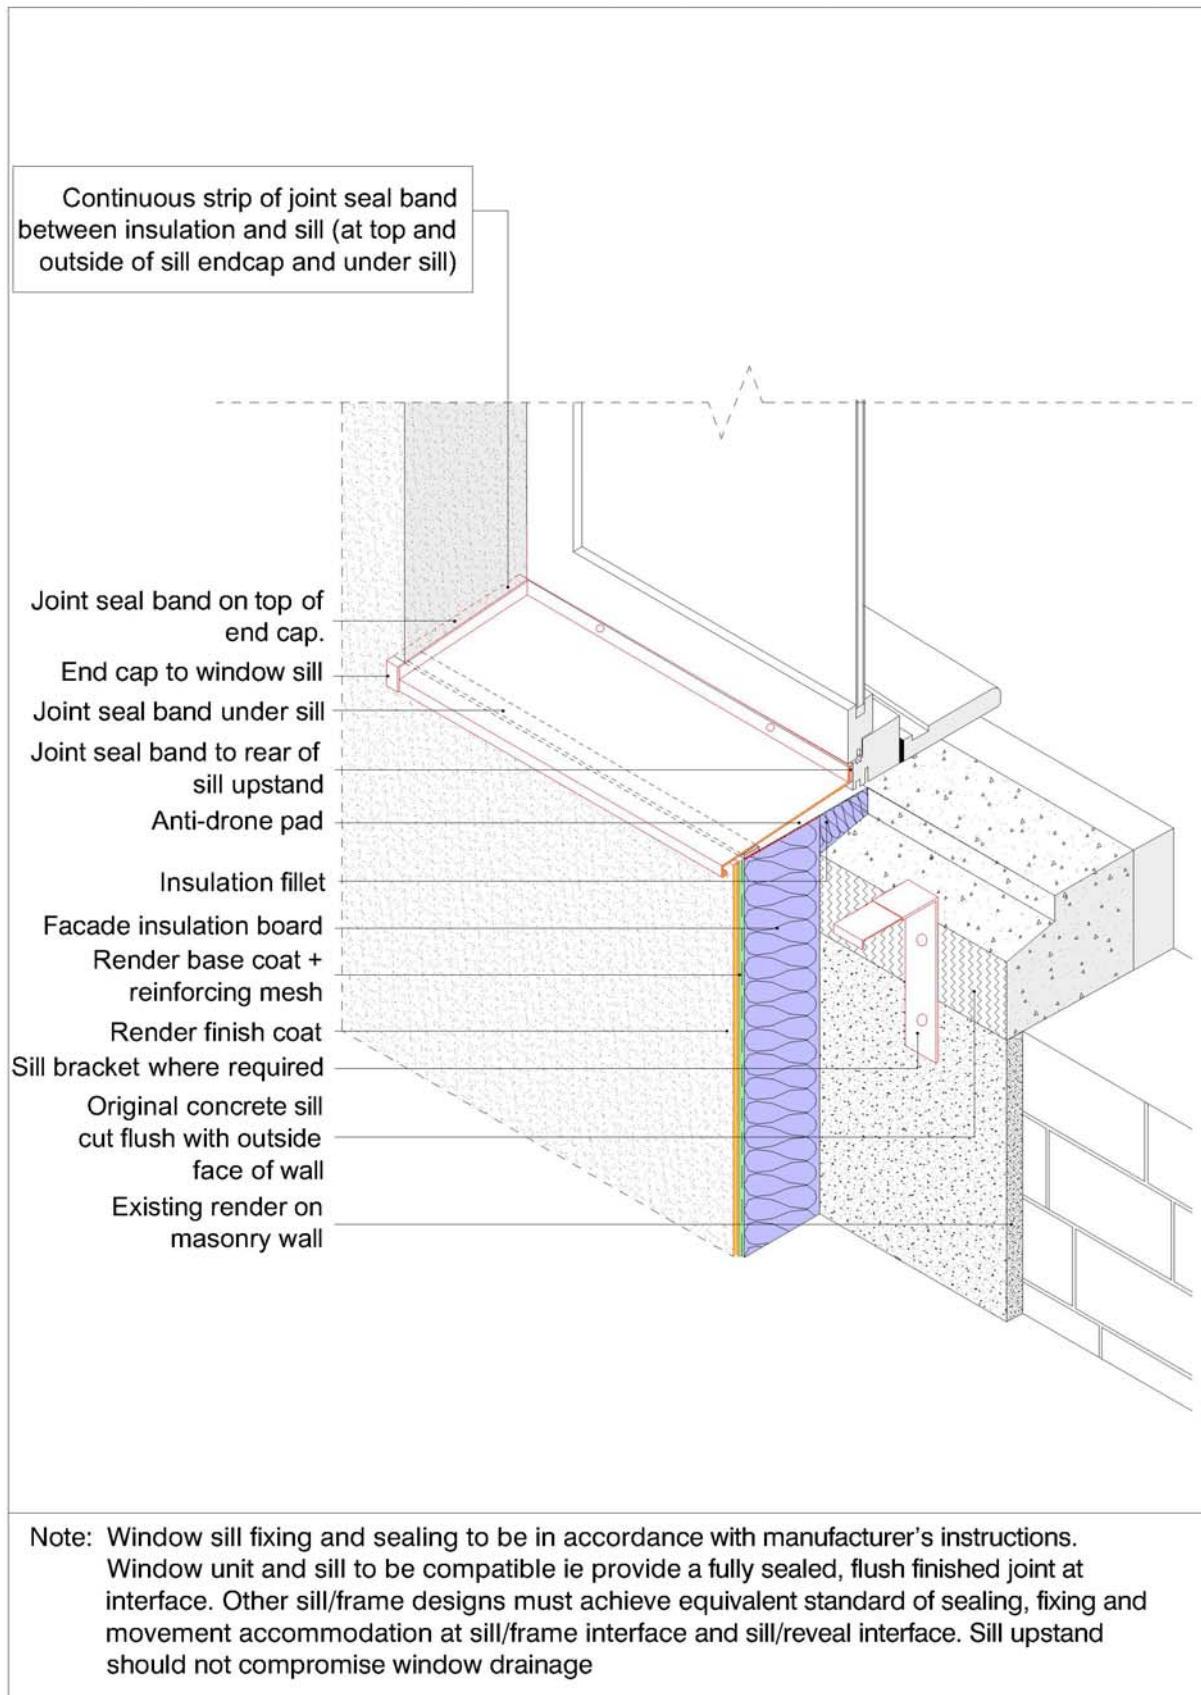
Typical detail – Window sill refurbishment – Isometric view
